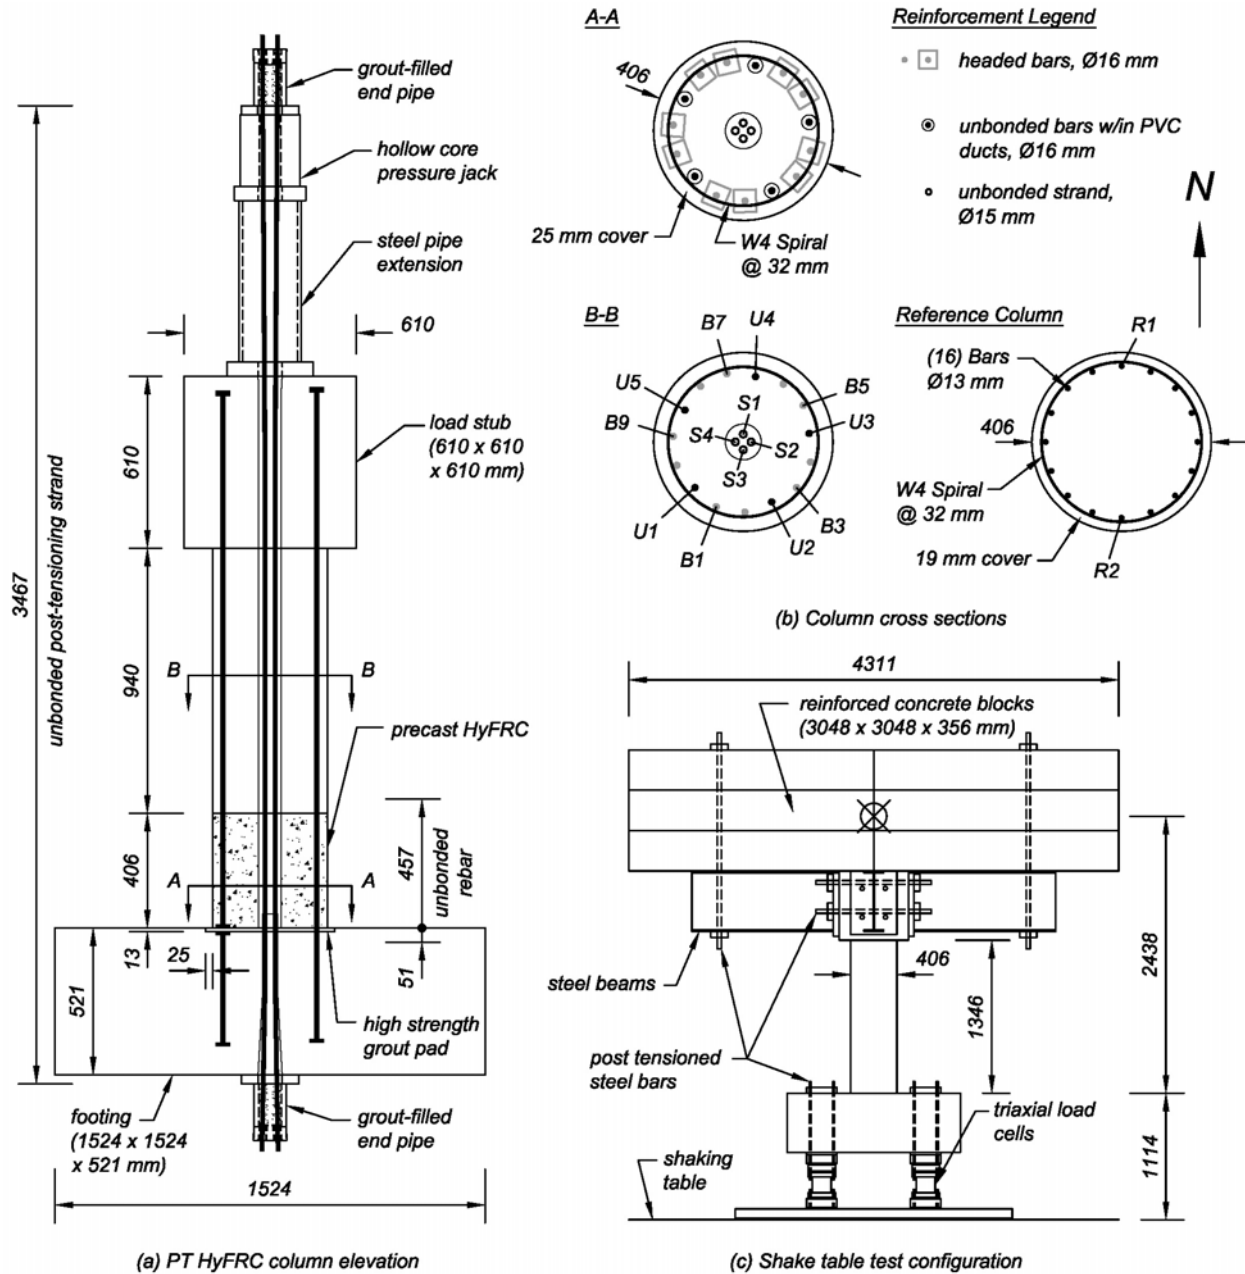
Schematic of test columns; (a) PT HyFRC column elevation, (b) column cross sections, and (c) shake table test configuration.
